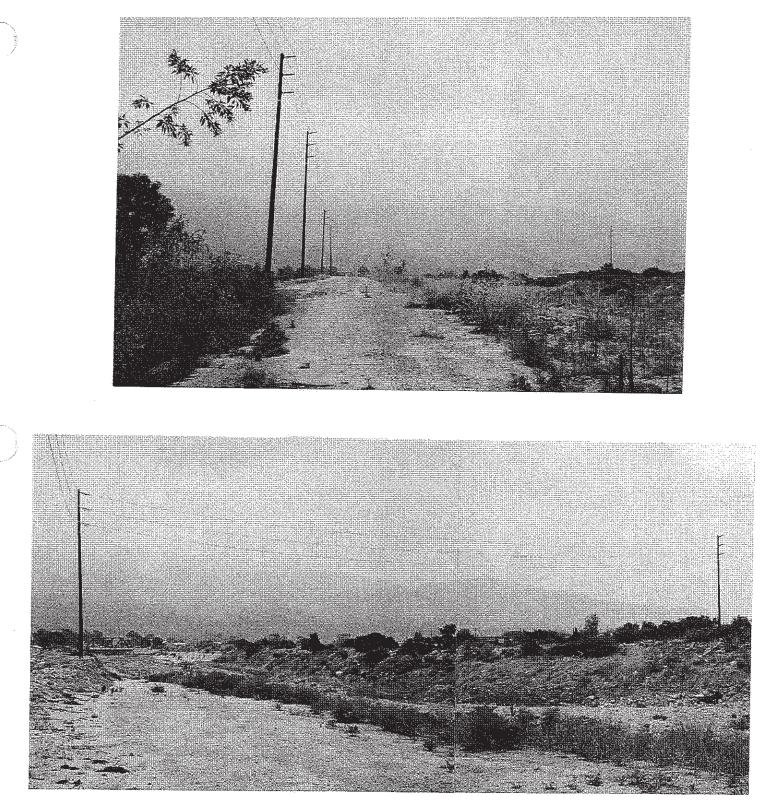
& 16. This view is looking downstream toward the railroad bridge that shows the utility poles that would require relocation. (June 1994)
